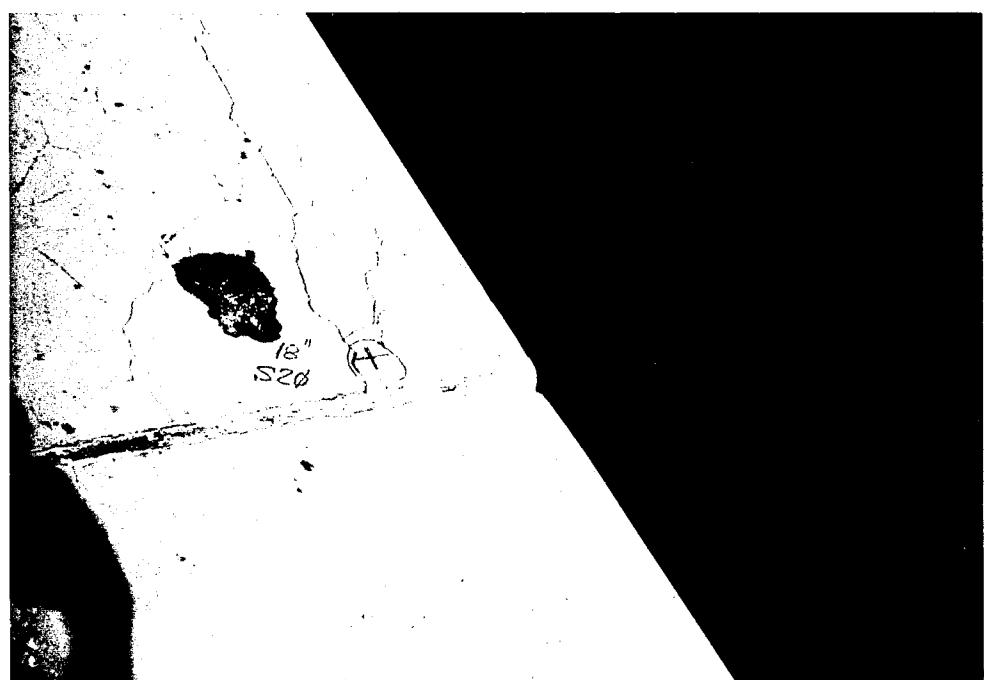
Cracks and stains in south seawall monolith S20 at joint 19/20
